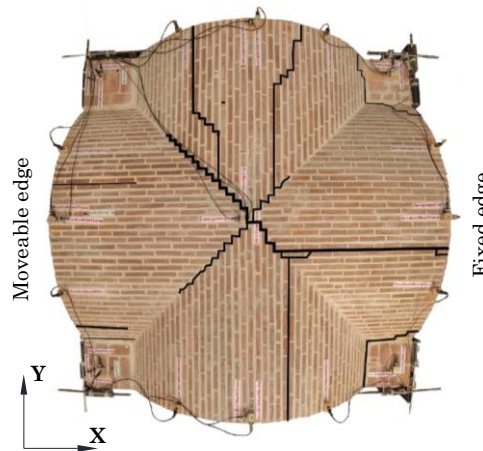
Collapse mechanism of unstrengthened masonry cross vault [22].
